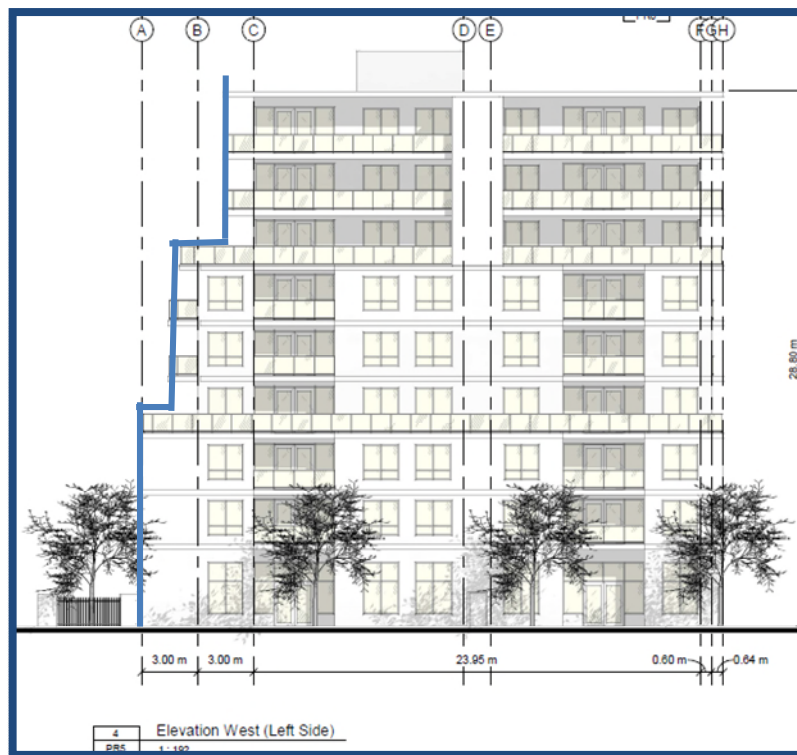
West Elevation (Left Side) showing 3.0-metre step backs
